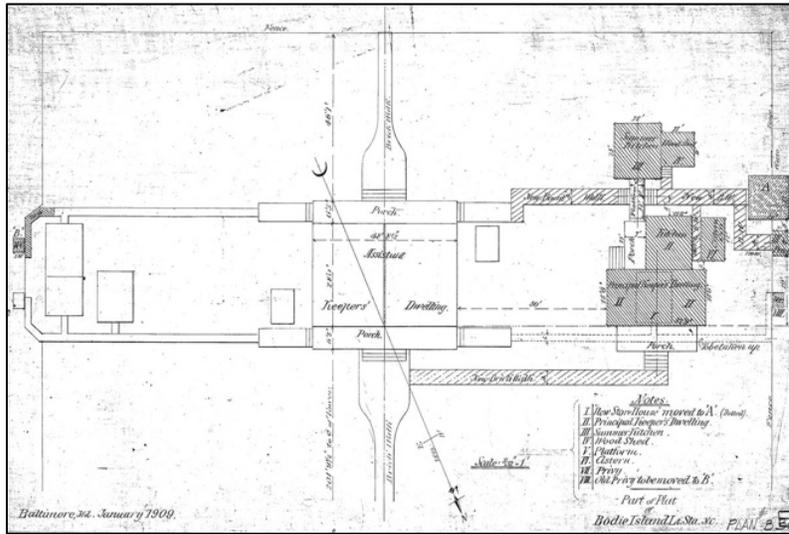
1909 plan. Note direction of north arrow. (CAHA Collection)
